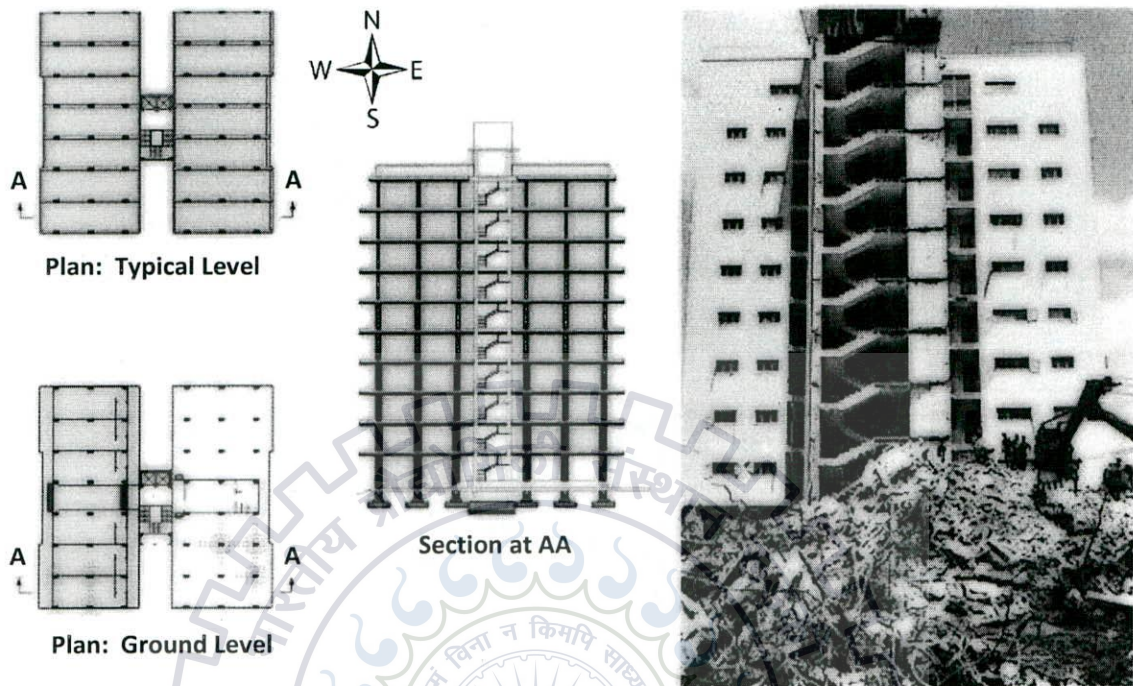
“The Palace Corvin” with one of two towers collapsed
